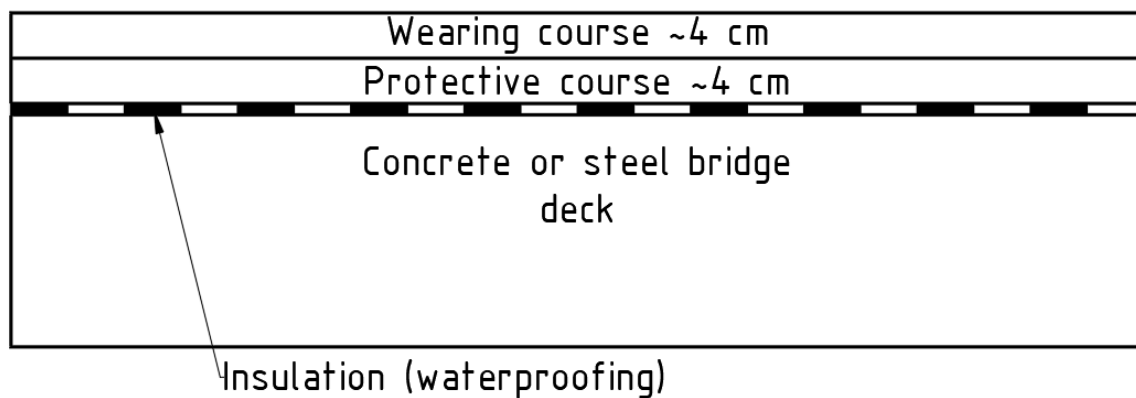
Typical arrangement of pavement layers on the bridge deck.
